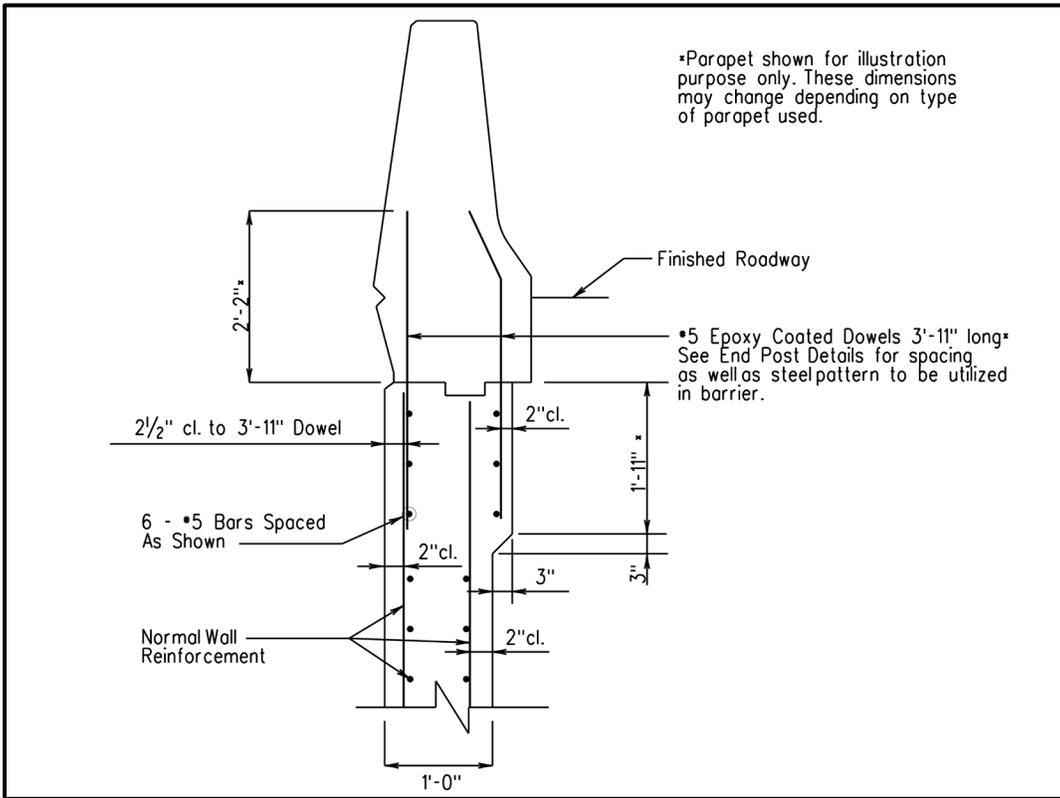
Parapet Attachment for Walls with 1'-0" Stem Thickness
